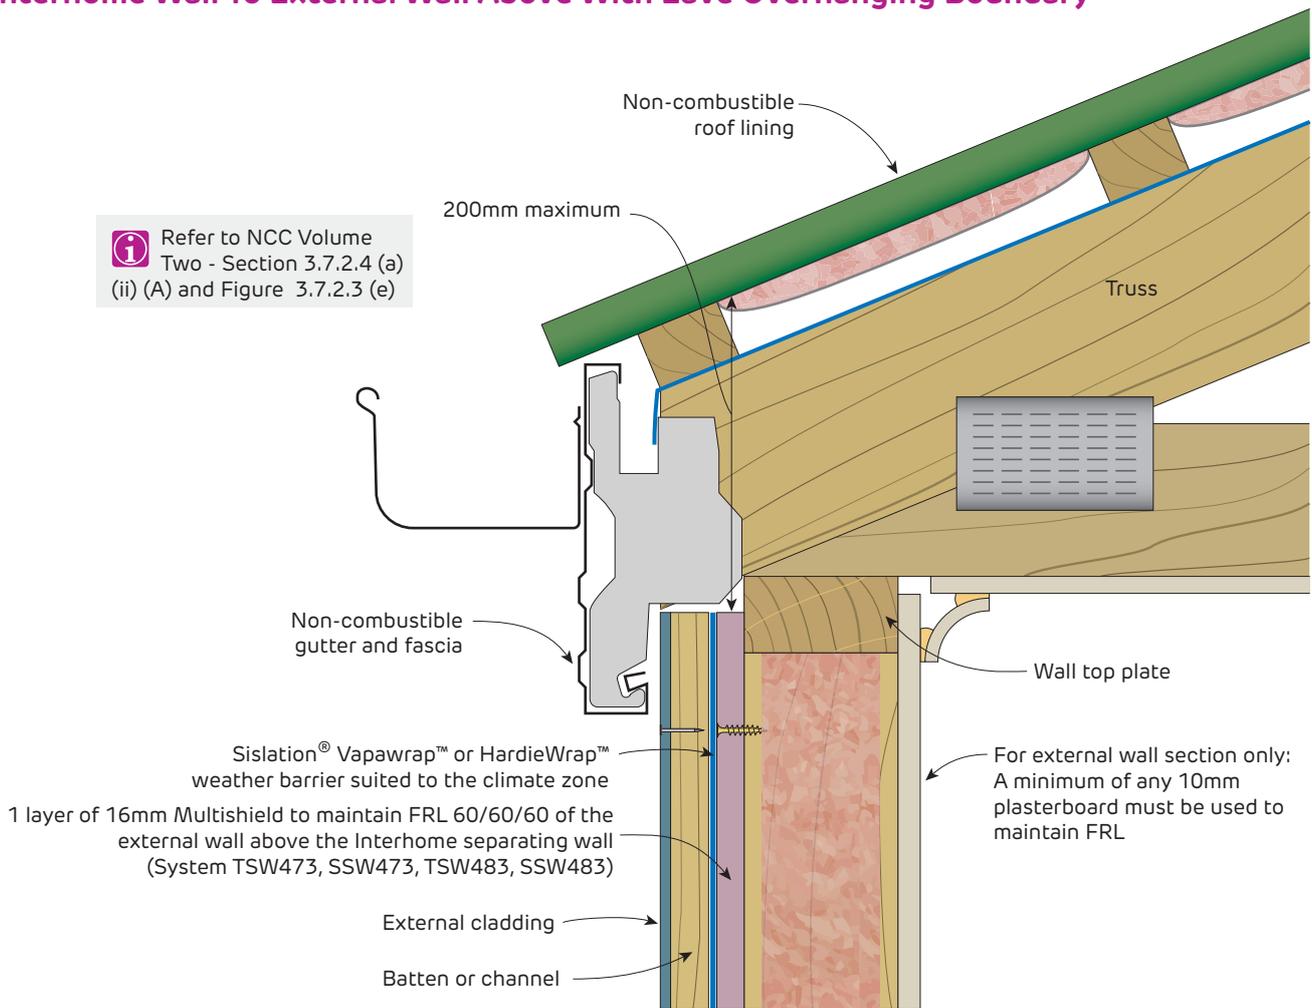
Interhome over Eaves - NCC Acceptable Construction Practice Option 1
